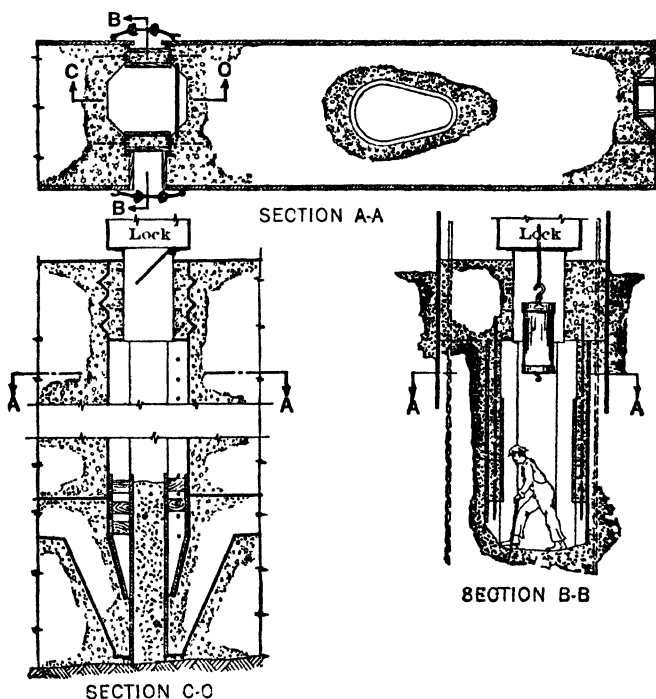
Coffer-Dam Wall Construction by Pneumatic Caissons
